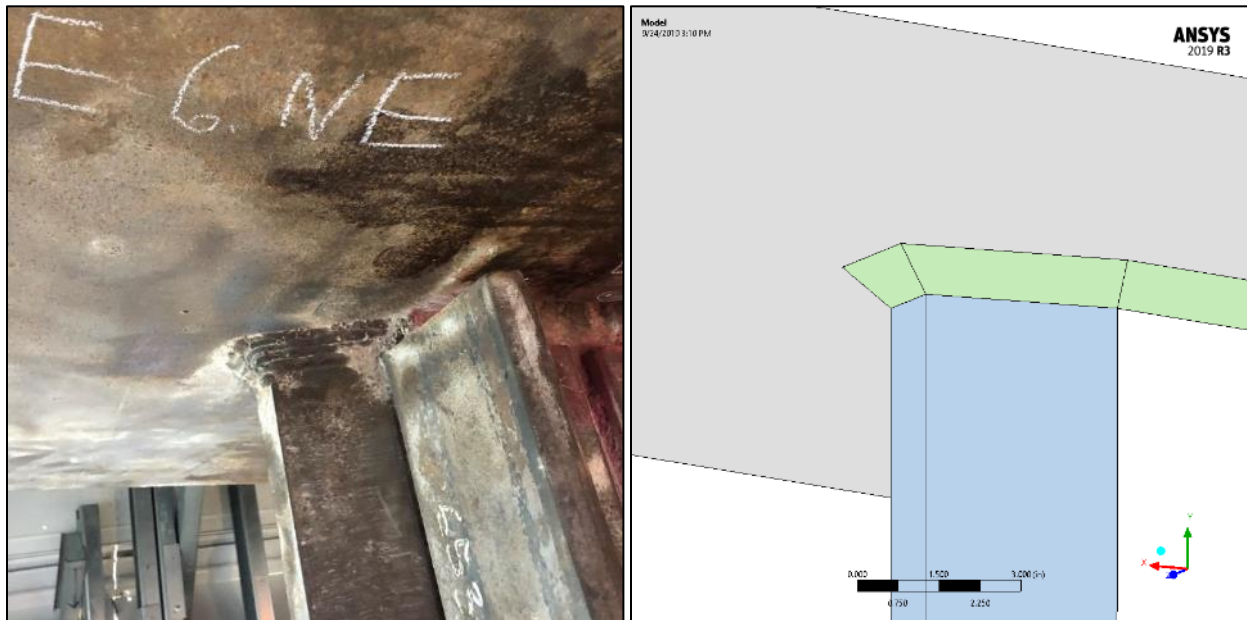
First Street South (“F”) wrapped fillet welds between bottom flange and hanger (bottom side of bottom flange).
